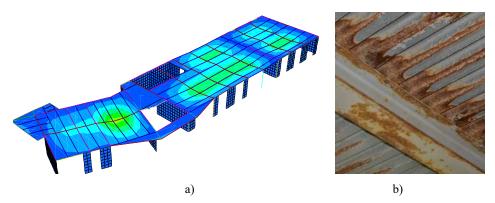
Deformed shape due to gravity loads, current floor (a) and extensive corrosion in the steel sheeting, localized corrosion in the steel beams (b)
